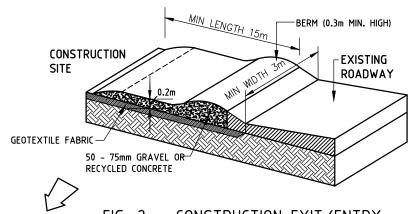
CONSTRUCTION EXIT/ENTRY
